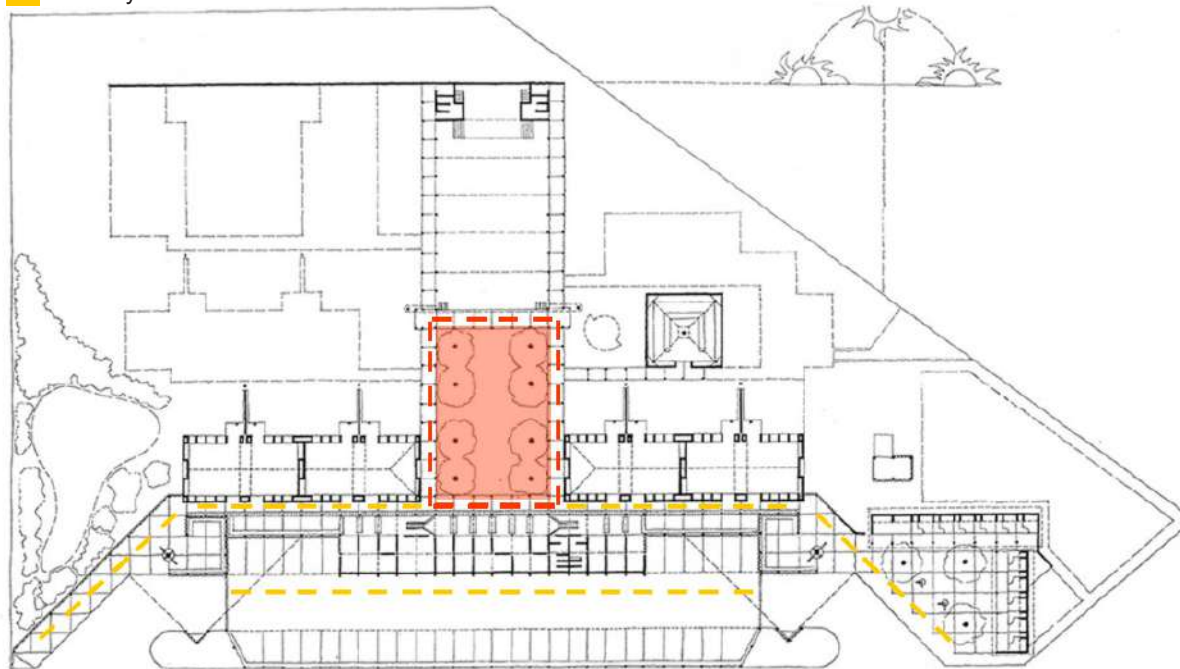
Floorplan of Duduza Resource Centre, indicating courtyard and articulated routes.
